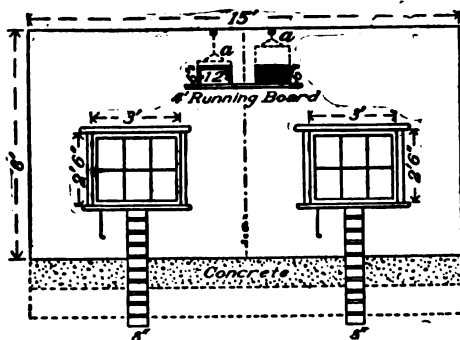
Plan of end of house connecting with flying pen, showing windows, ladders, alighting board and small flying exits which are closed by means of sliding doors worked by cords from the passage inside.
